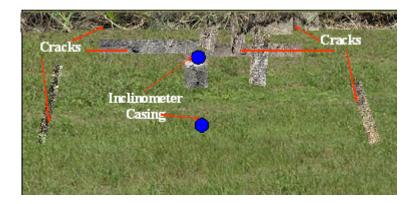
Approximate view of surficial cracks in control section formed in June 2008 at Joe Pool Dam
